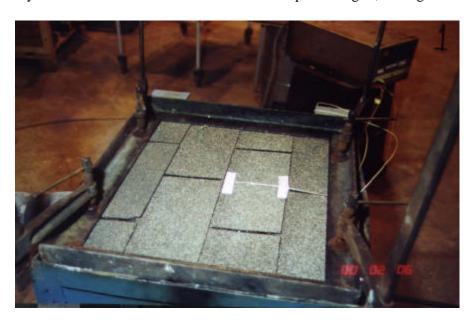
Specimen on top of the small fire resistance furnace, specimen size 500 mm by 600 mm.
